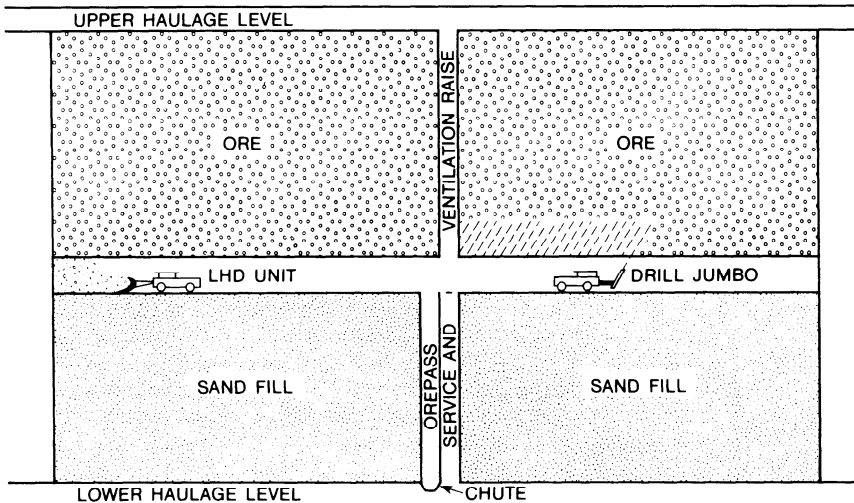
Longitudinal section of a mechanized back stope.
